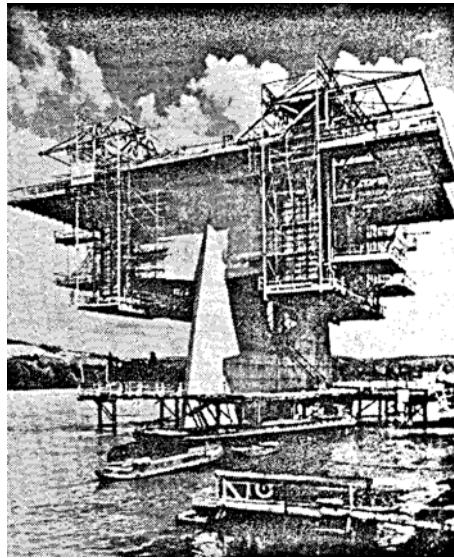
Cantilever operation on the west river pier (Finsterwalder 1965)
